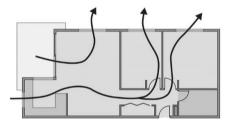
effective layout for an upper level corner dwelling/apartment.
